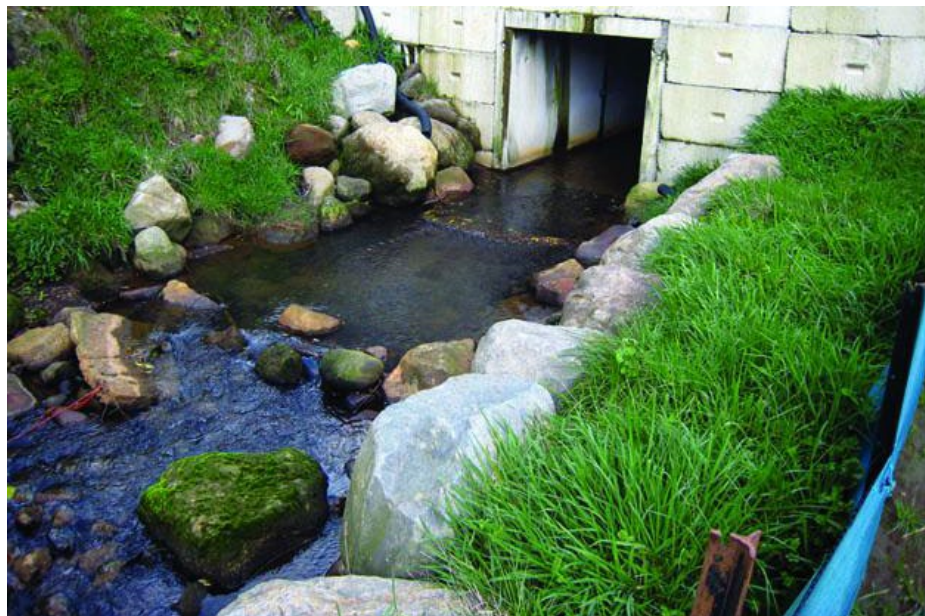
A rock ramp constructed to enable fish passage through a culvert by creating a pool downstream. (Photo credit: NIWA)
